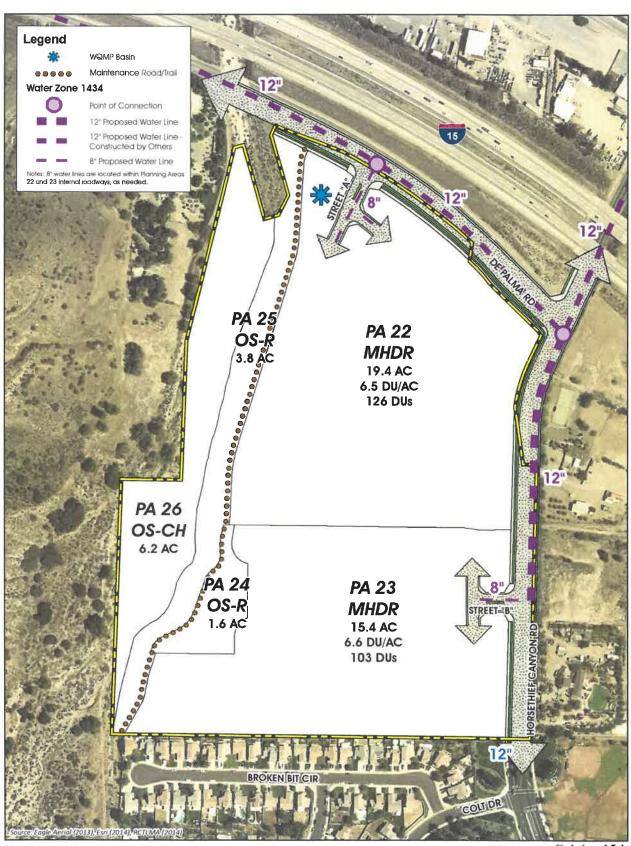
, 15A, and 15B illustrate the location and size of the backbone water and wastewater infrastructure designed to serve the Horsethief Canyon Ranch (Planning Areas 22 through 26 portion). Furthermore, the location of the on-site wastewater treatment plant is denoted within the North Neighborhood in Planning Area 19.
